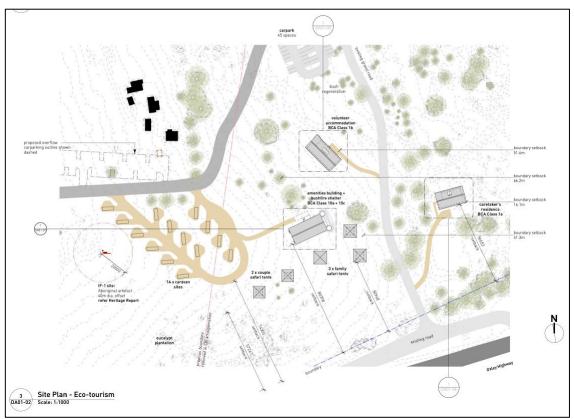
Detailed Site Plan (residential accomodation and camping ground
